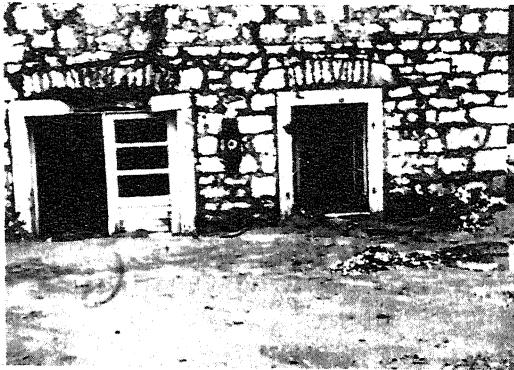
Damage due to liquefaction: sinking of house and soil, house floor and its surrounding covered with outbursted sand, cracks in the walls
